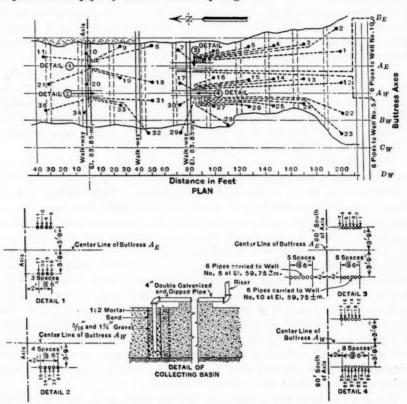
PLAN SHOWING LOCATION OF RISER PIPES FOR FOUNDATION TESTING SYSTEM, RODRIGUEZ DAM.
